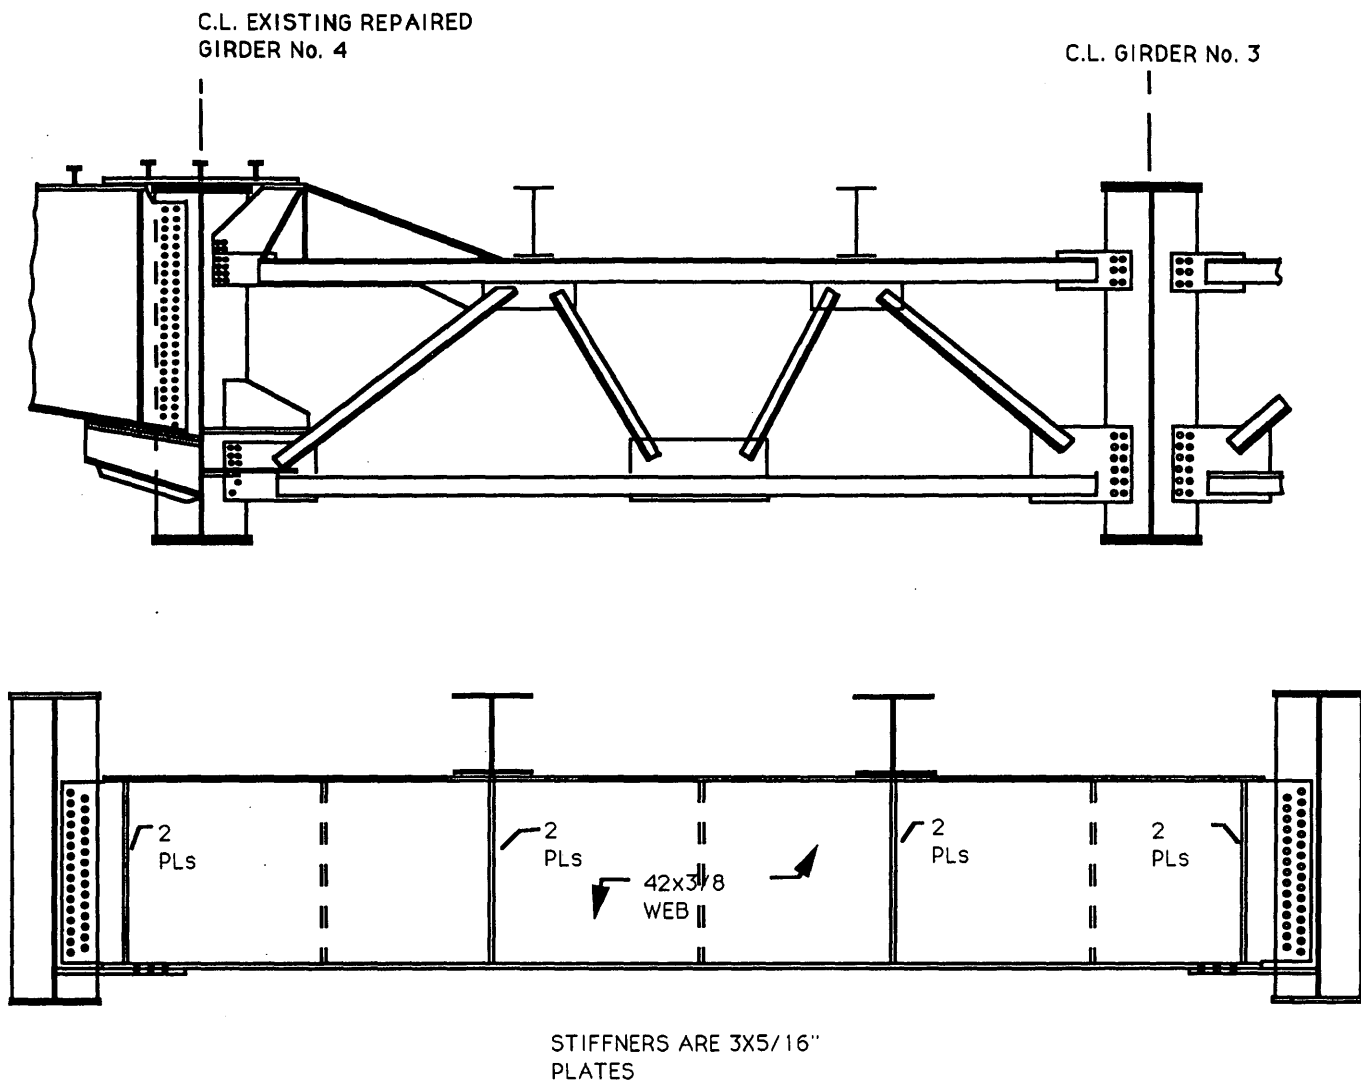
Top, typical floor truss; bottom, typical transverse floor girder.
